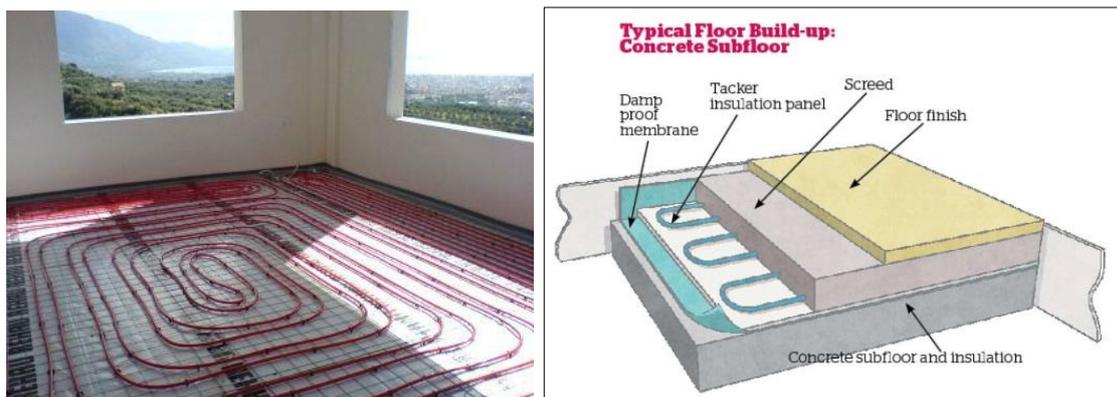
Typical layout (left) and typical intersection (right) of an under-floor system
